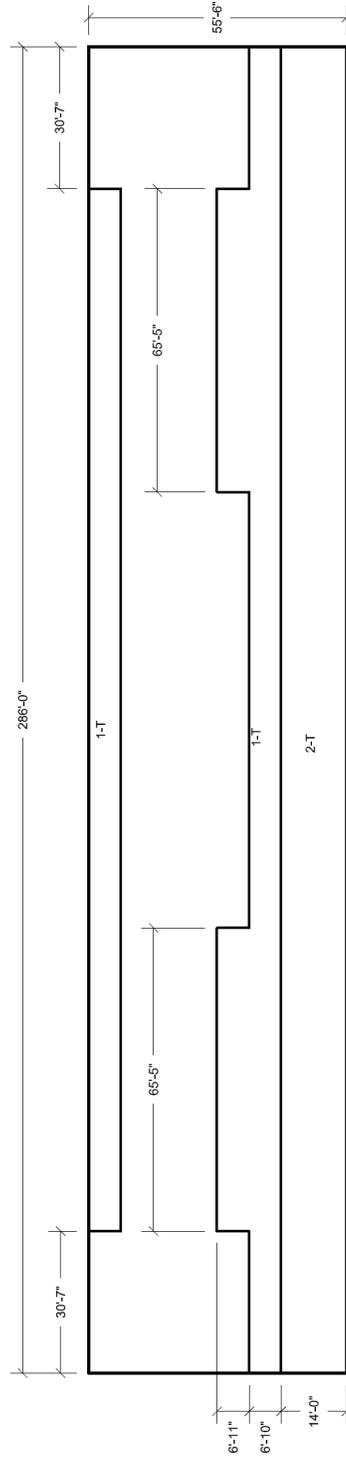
H.6-112-COOLING TOWER NORTH (AND SOUTH) WALL LOOKING SOUTH (NORTH)
